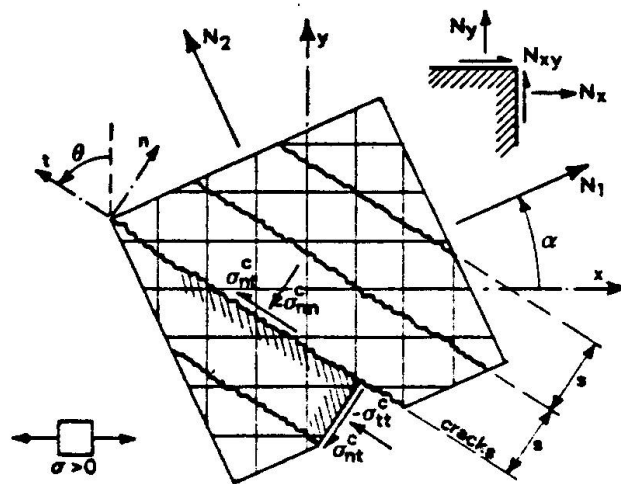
Forces on the Cracks in Reinforced Concrete
